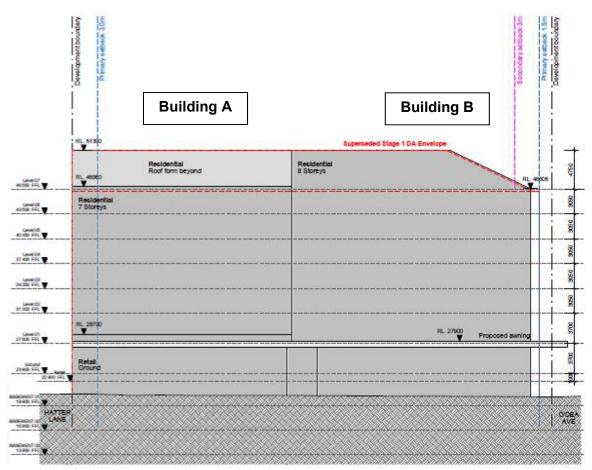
O'Dea Ave elevation illustrating Building A and Building B envelopes.
